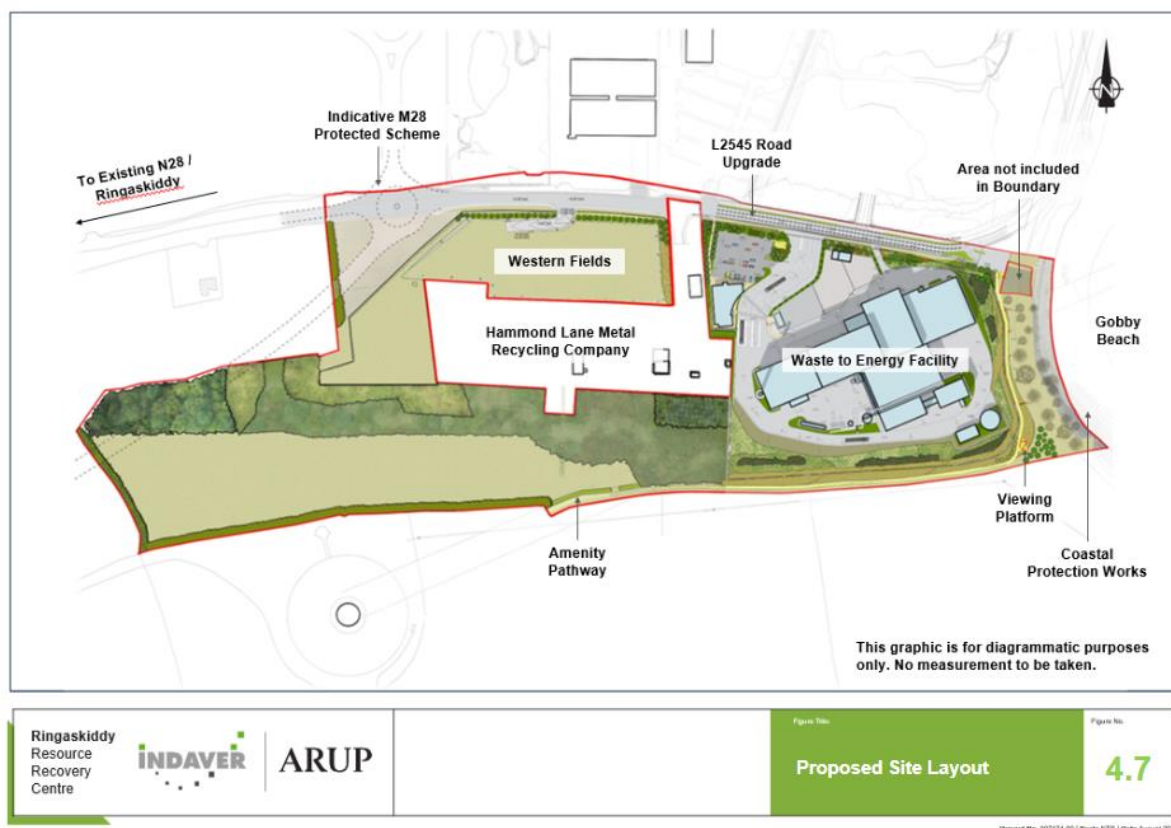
Proposed Site Layout Plan (Site outlined generally in red)
